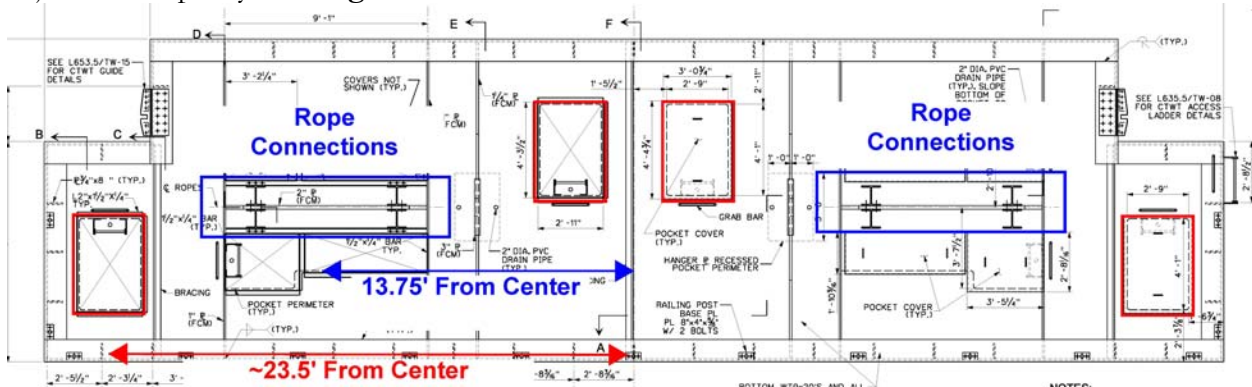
Plan View of Counterweight Pocket and Rope Locations, Example 1.
